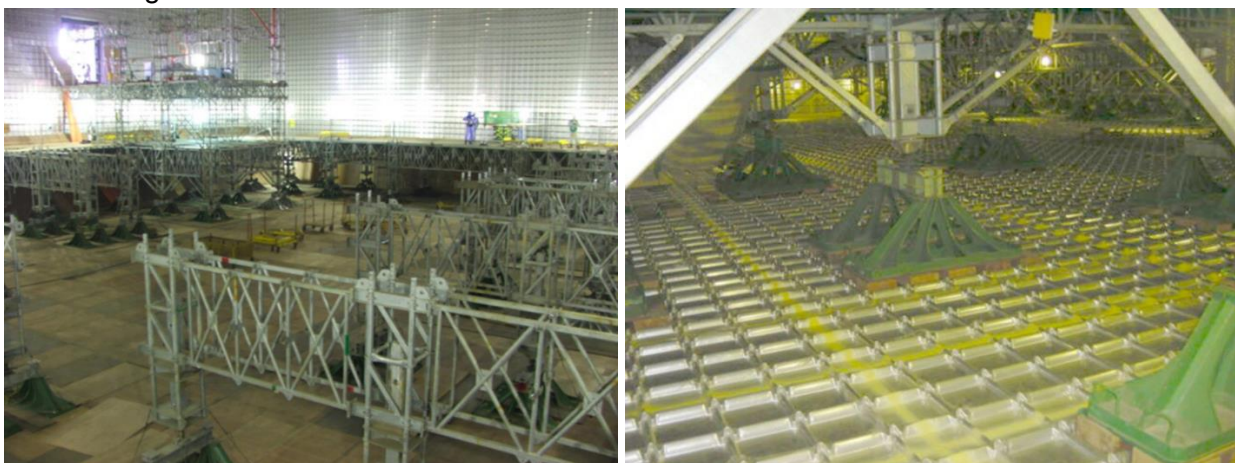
Scaffolding Systems Floor Protection (courtesy Technodyne Ltd, Eastleigh, UK)
